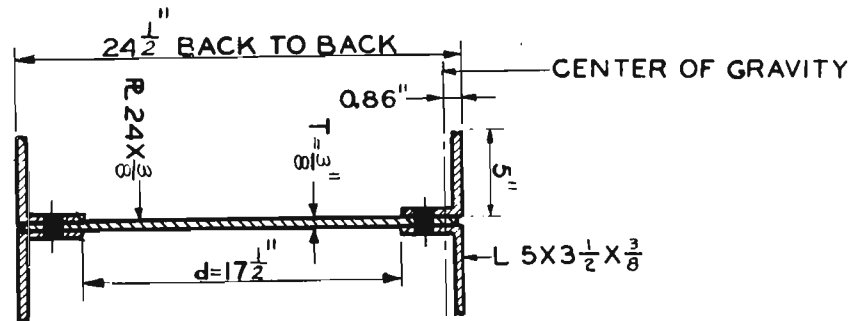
Cross section through riveted plate girder equivalent to 21-inch 63-pound rolled beam.
